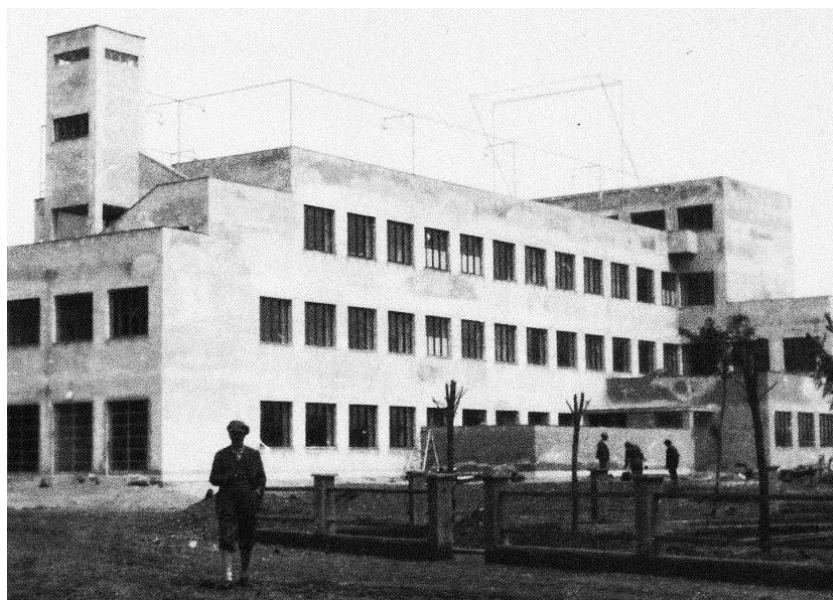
Archive photo of the roof terrace (Fondation Milan Zlokovic)
